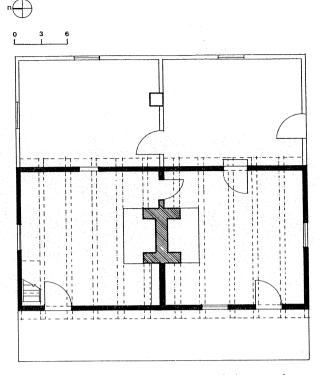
Plan of slave house at Howard's Neck. (Drawing by Carol Silverman.)
